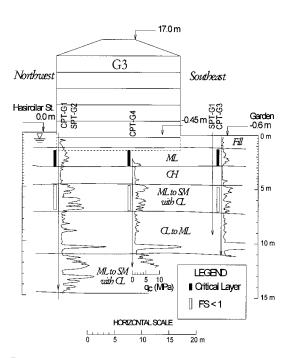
Northwest to southeast generalized subsurface profile of Site G
